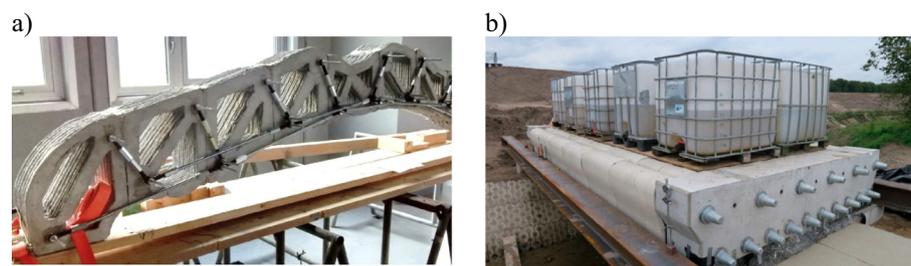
a) 3D printed beam with a steel reinforcement [126], b) In-situ testing of the printed bridge [128].
